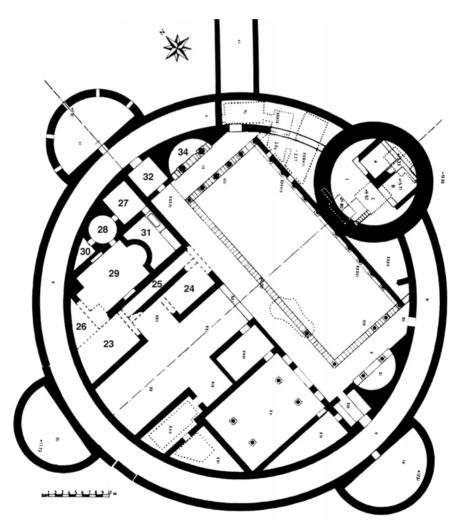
A Ground plan, Testa, Herodion IV, plan 1
